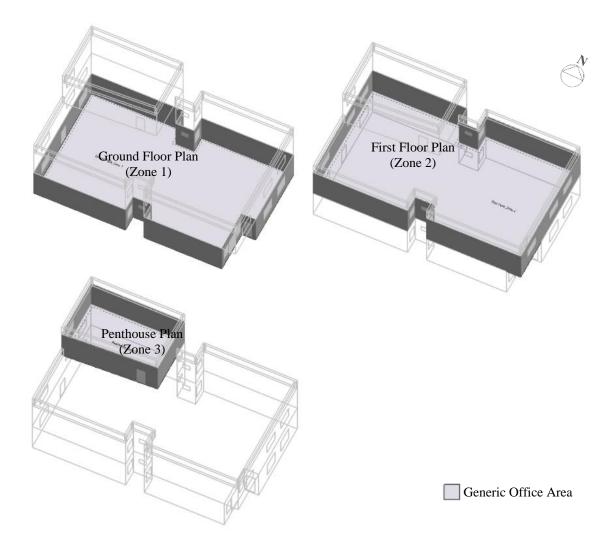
Building floor plans indicating zones, in DesignBuilder simulation software.
